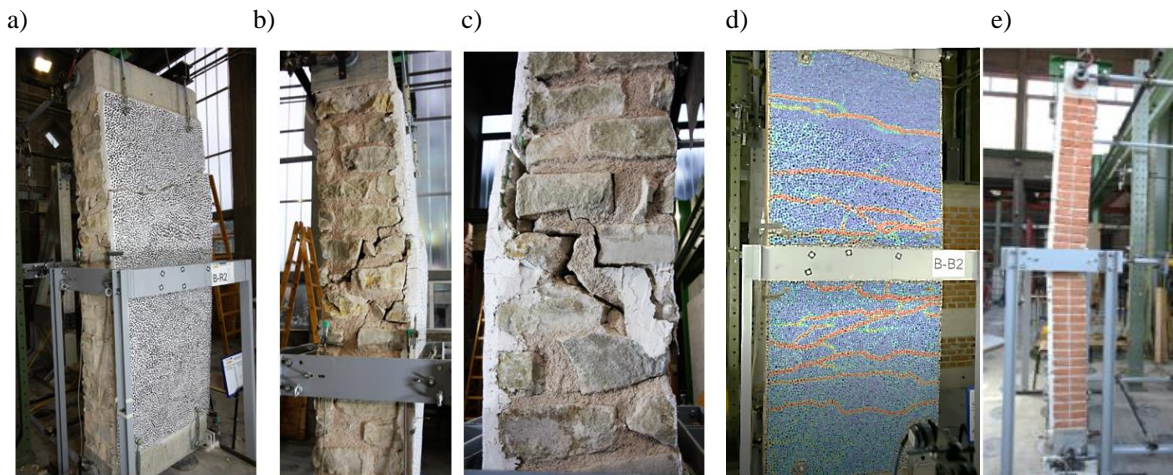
Stone masonry specimen at the end of the bending test on reinforced side (a); detail of the cracks on the specimen (b), (c); brick masonry specimen on the reinforced side (d) and lateral side (e)
